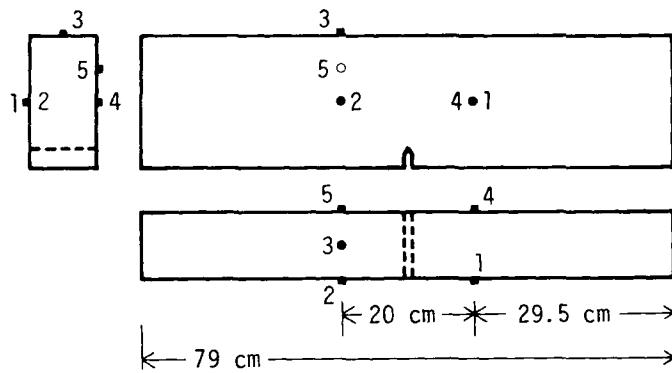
Position of Pick-ups on Beam AE-2.
